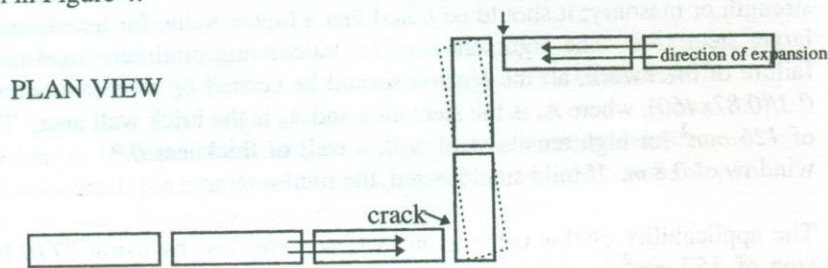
Cracking due to moisture or thermal expansion when two long walls are connected by a short wall.
